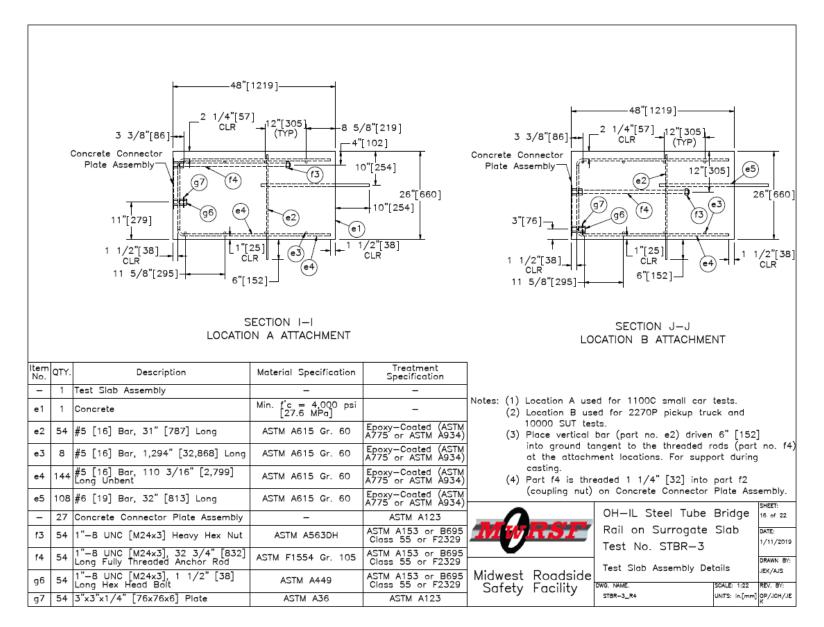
Test Slab Assembly Details, Test No. STBR-3
